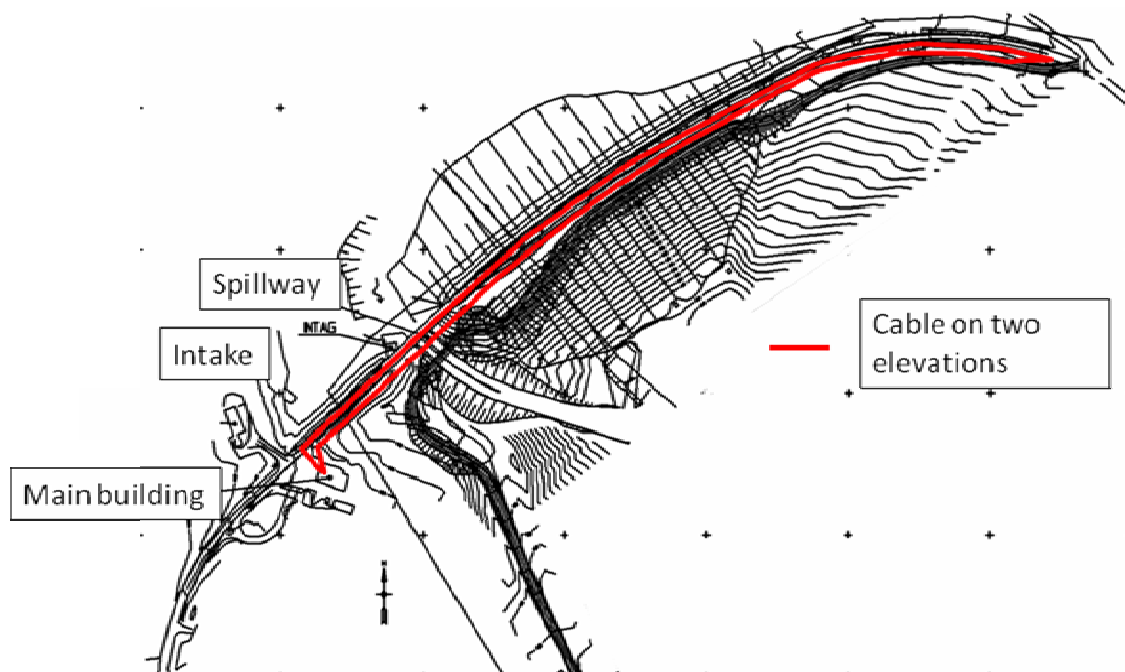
Plan of the Ajuare dam with principle layout of the fibre.
